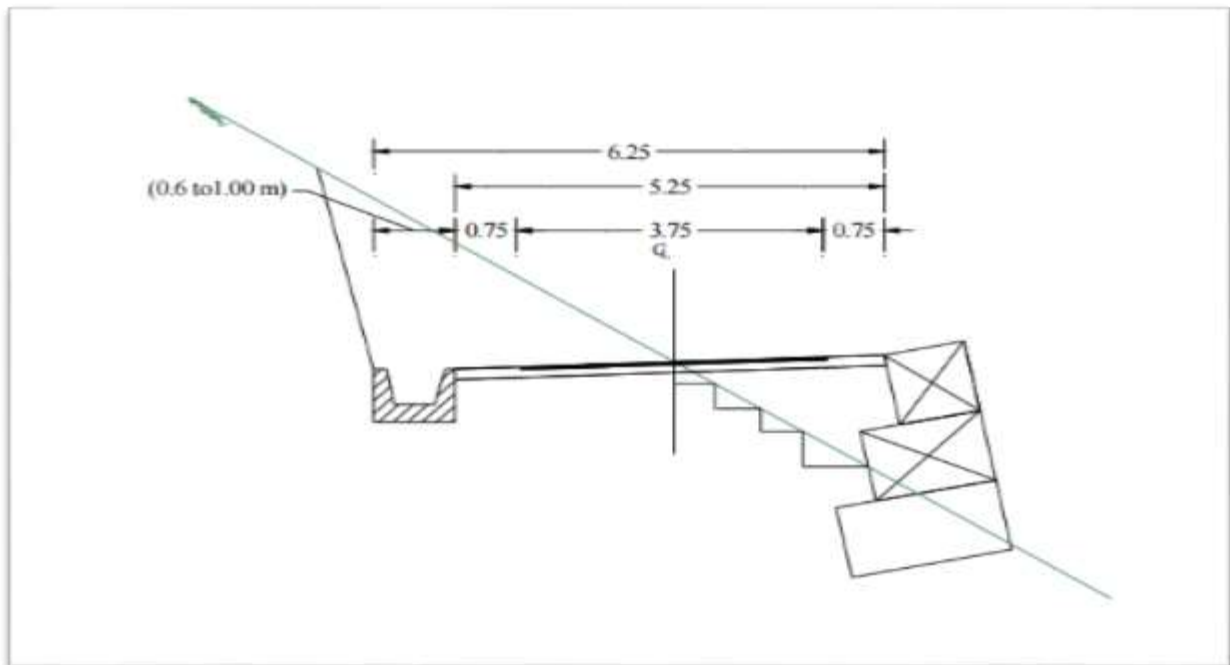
Single Lane Road with drain in Hill area of District Road – Core Network
